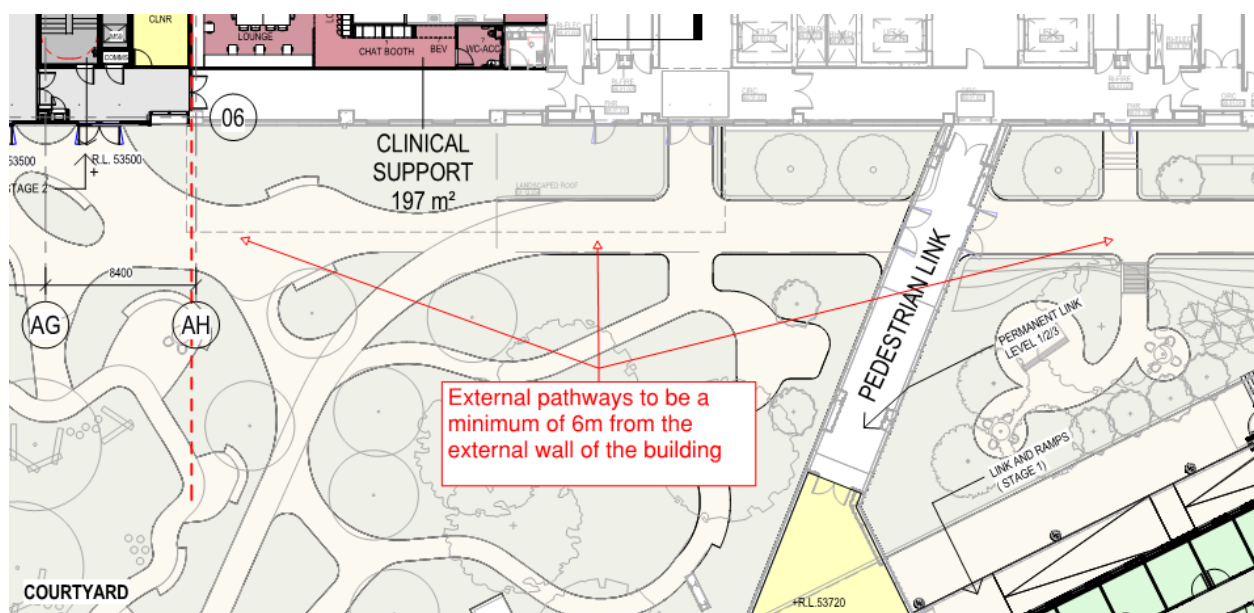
External pathways to be located a minimum distance of 6m from the external wall of the building
